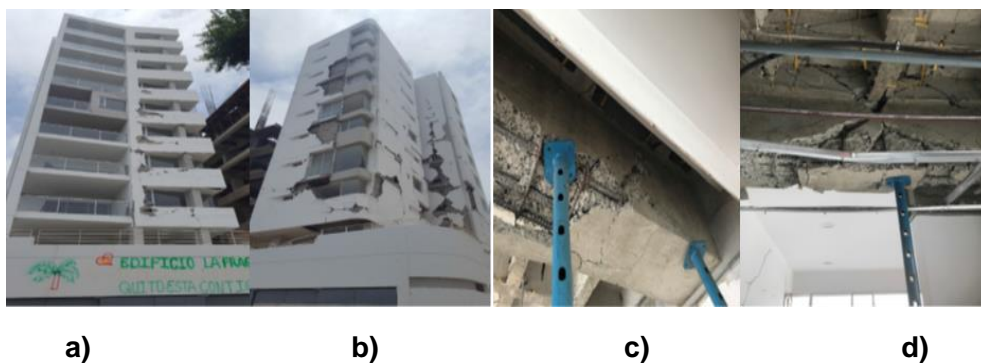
(a) The Fragatas Building of 10 floors of reinforced. (b) Detachment of covering in frontal and lateral facade; (c) Failure for butcher close to the right support of the girder; (d) Damage in girders and slab for butcher's effect.
